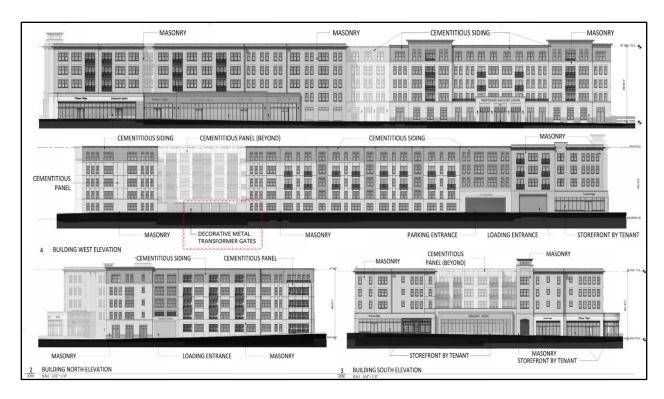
Site Plan No. 820180190A proposed elevation changes for Multifamily building
